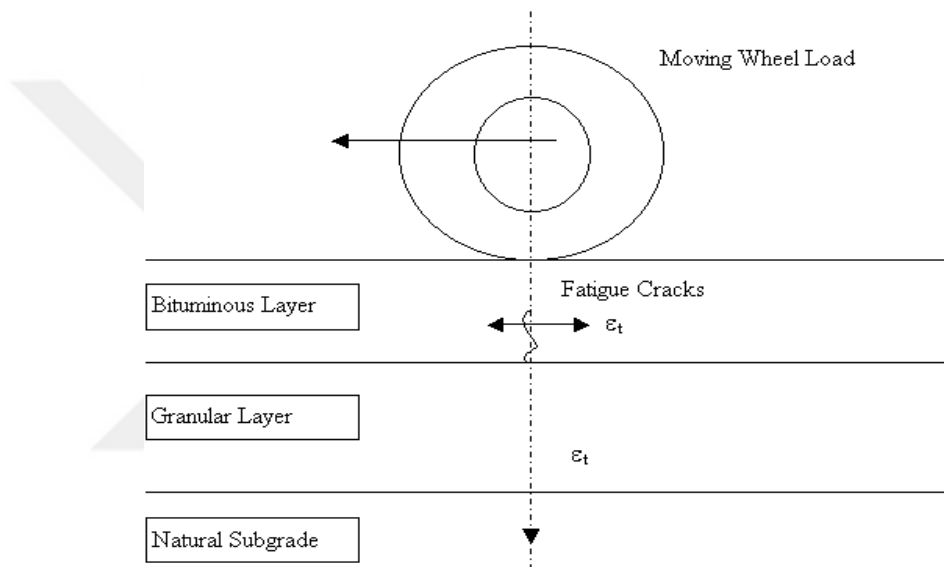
Fatigue cracking in bituminous pavements (Brown, 1980)
